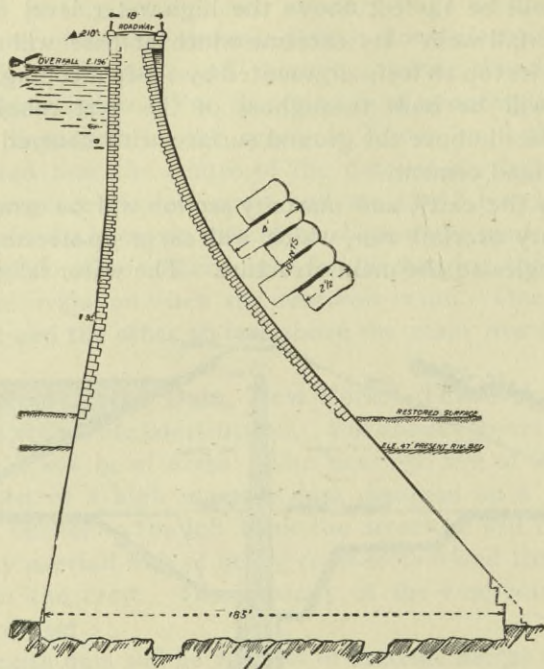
CROSS-SECTION OF MASONRY DAM, NEW CROTON DAM, CORNELL'S.
